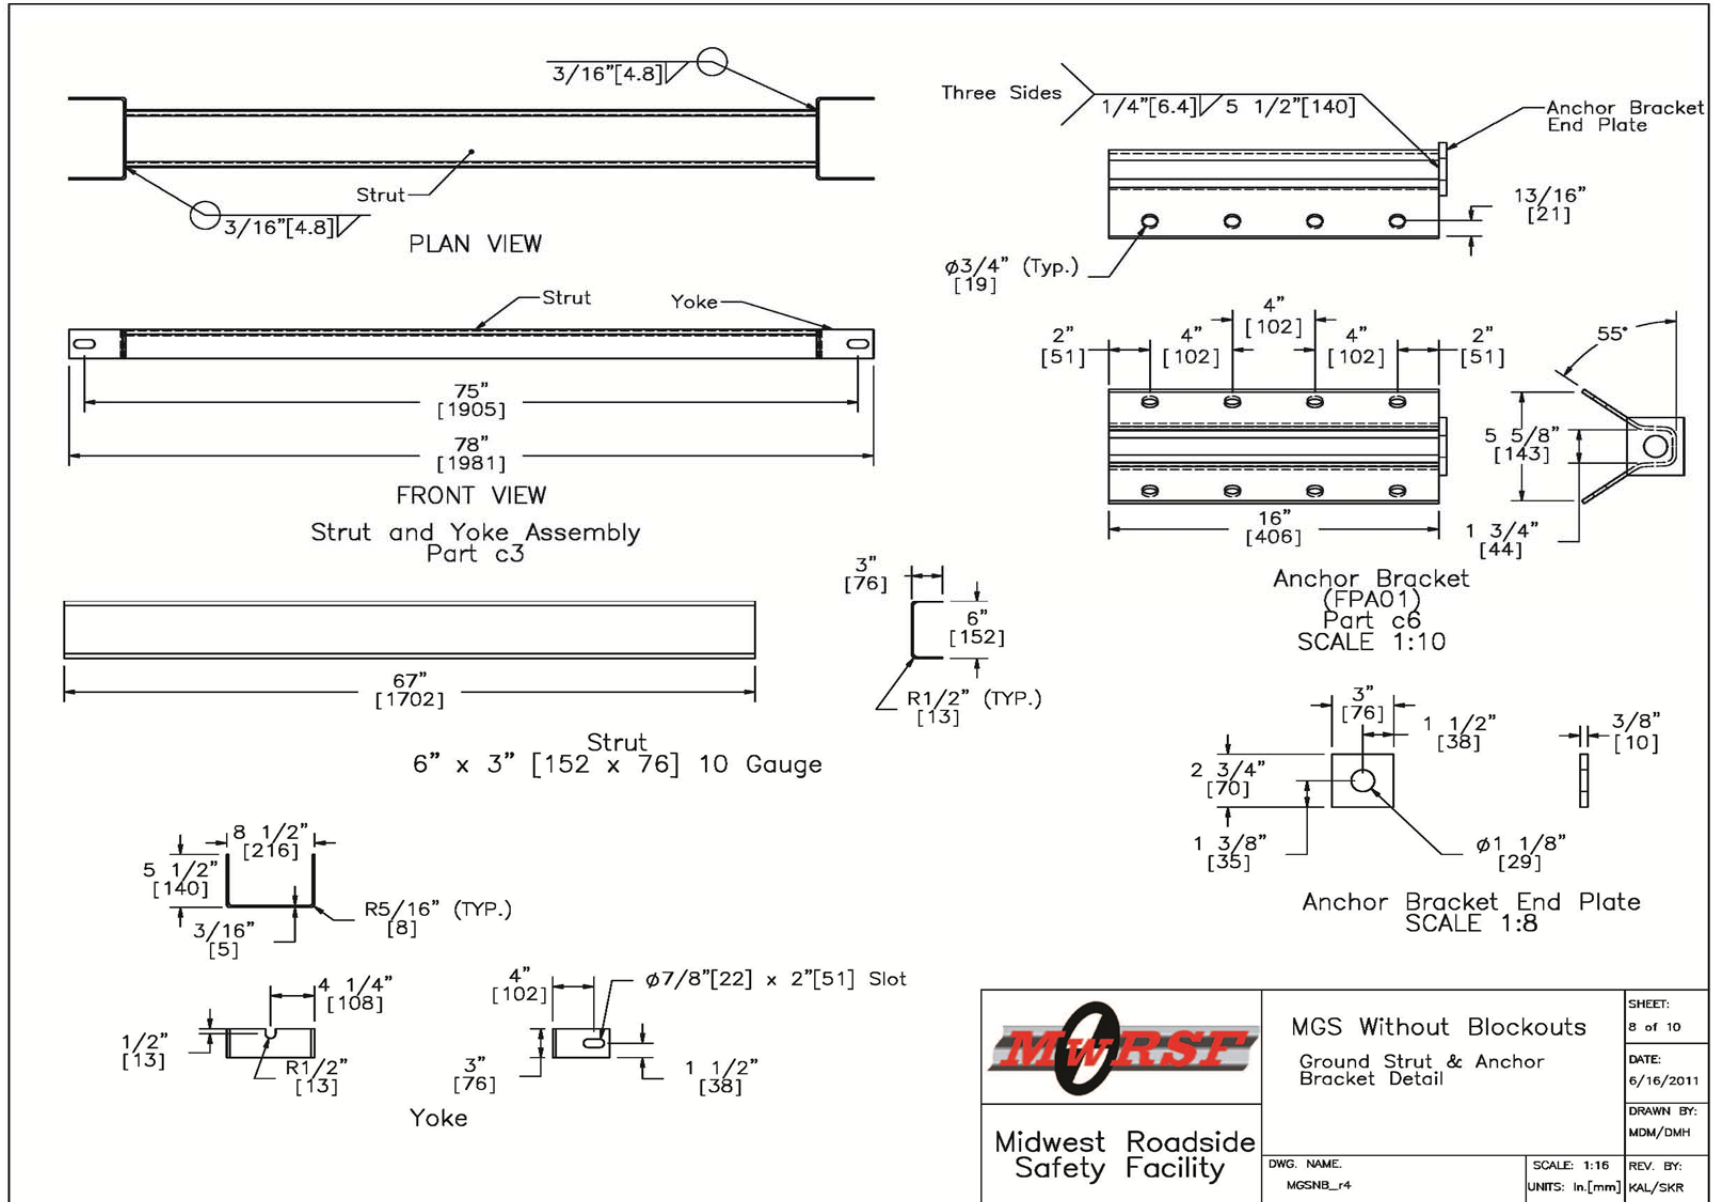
Ground Strut and Anchor Bracket Details, Test No. MGSNB-1
